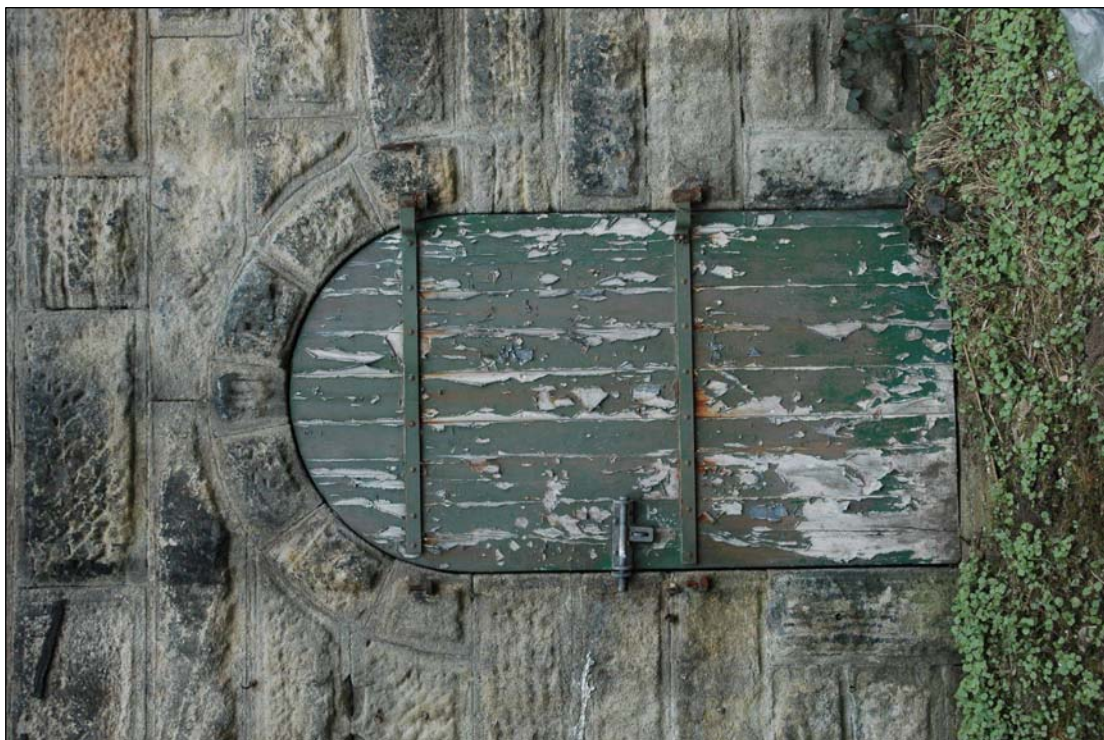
Detail of arched battened door in south facing elevation of building 9, note rough finished stonework (2005)
